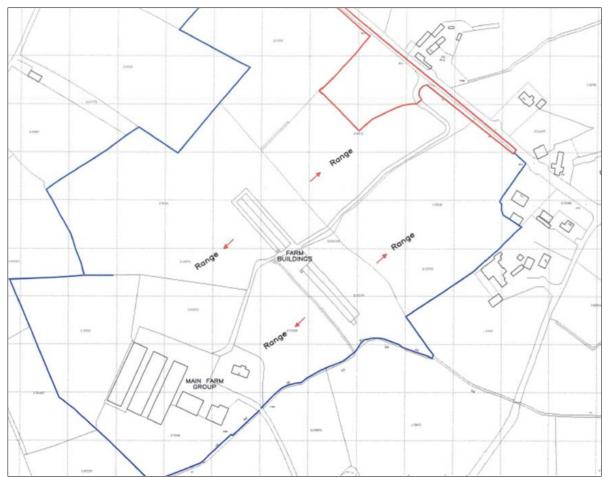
Site location plan showing site outlined red and applicant's farmlands including buildings outlined blue
